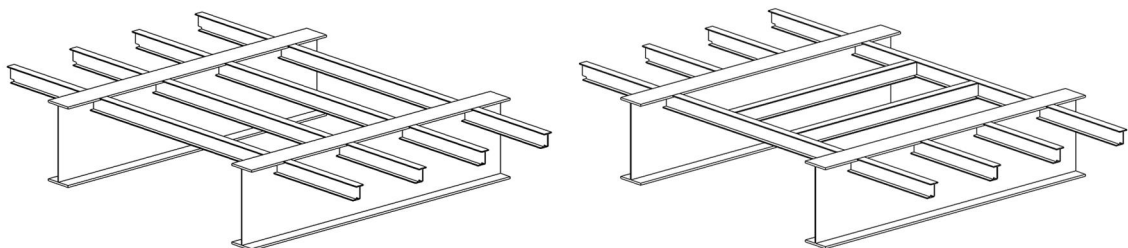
Original frame structure (left) for transverse panel arrangement. Redesign version of the frame structure (right) for transverse panel arrangement.
